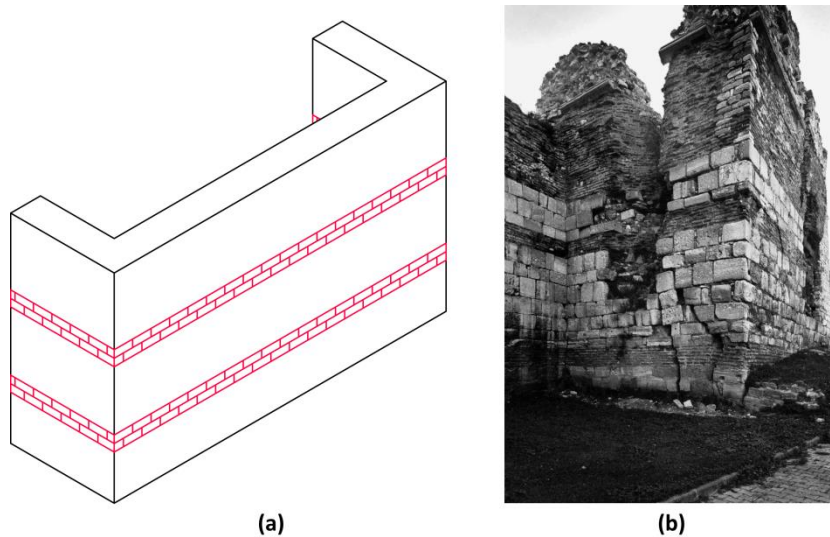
(a) Subdivision of the wall with brick horizontal courses; and (b) original city wall constructed using horizontal brick masonry bands in Istanbul, Turkey (Langenbach 2007)
